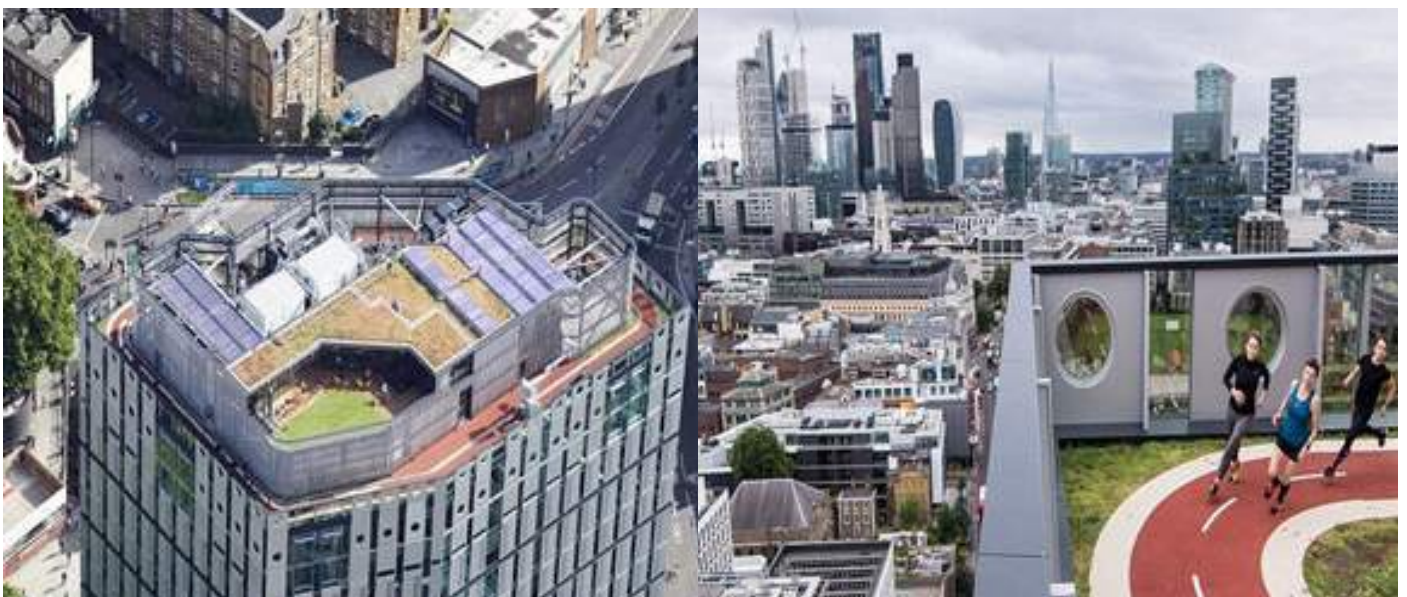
Rooftop running track and recreational area in London which has a Permavoid Blue – Green stormwater storage and irrigation structure beneath the surface
